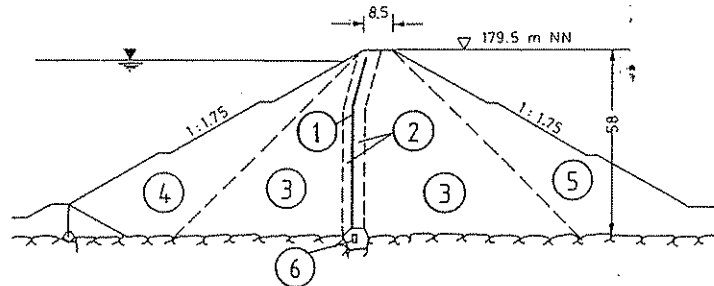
Typical section of a rockfill dam with internal sealing of asphaltic concrete. Example Grosse Dhünn, Germany 1980 (adapted from Breth & Arslan 1990).
